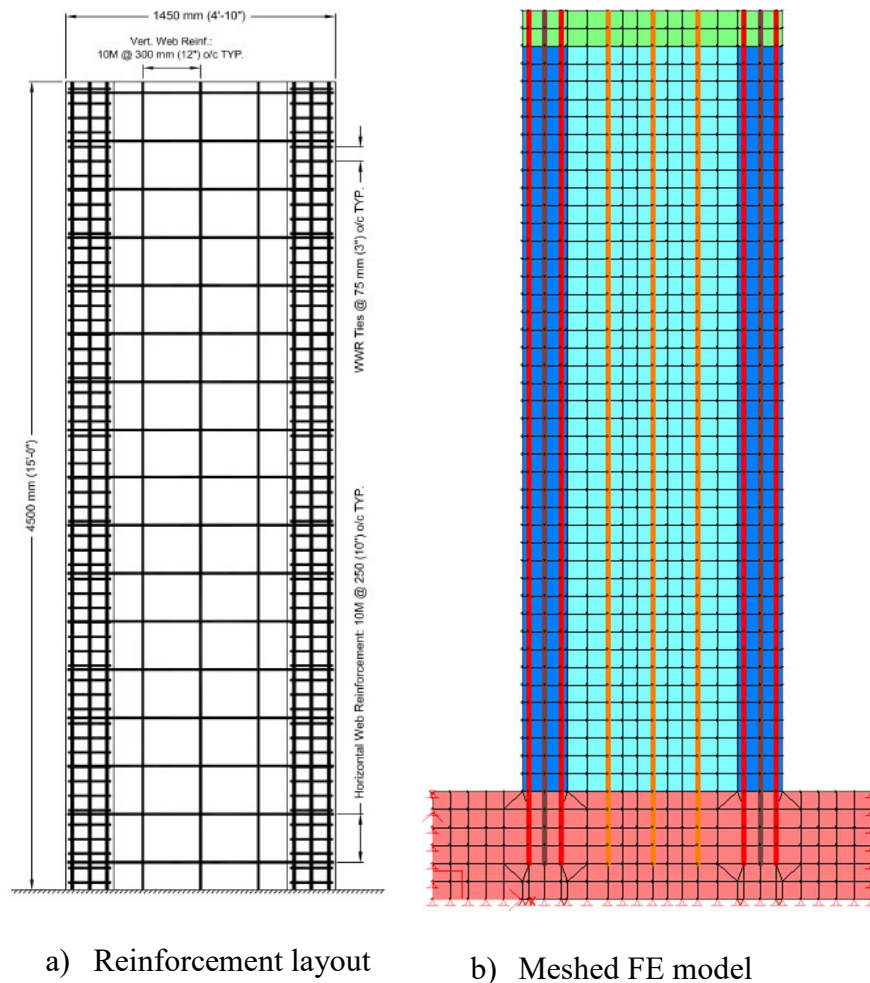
Details of Wall 3 (Navidpour, 2018)
